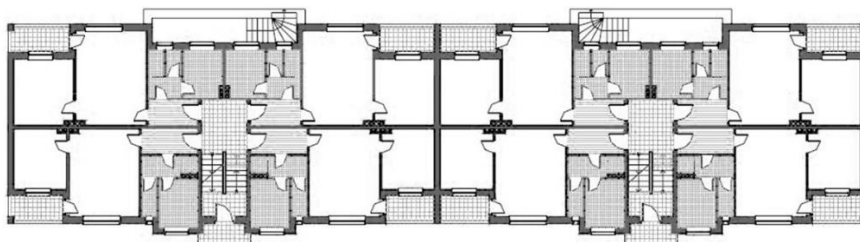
16. Type 3 Plan Layout (Recoloring by Merve Köz, original plans from Asiliskender, 2002, p. 85).
